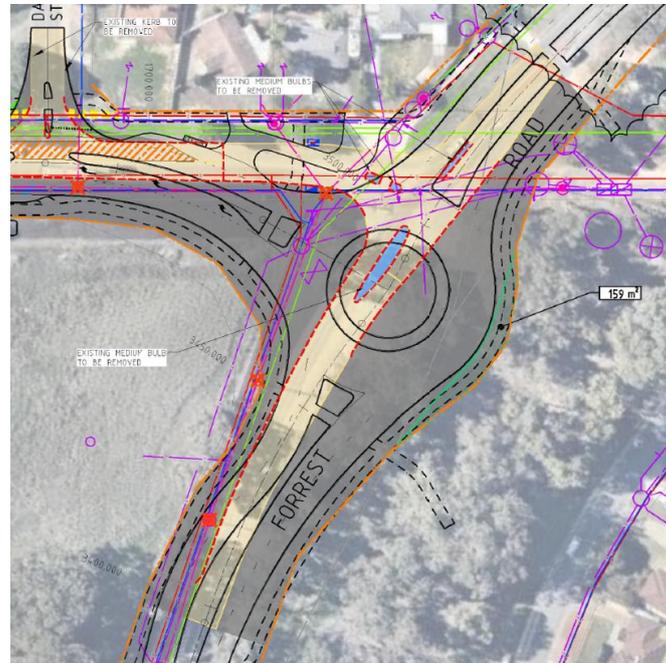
MRA – Concept Intersection Plan for Eighth and Forrest Roads
